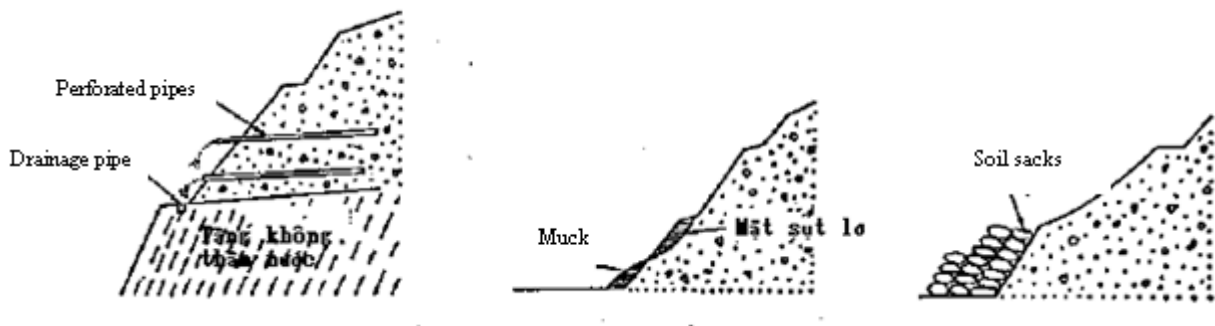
Drainage with horizontal boring and stacked soil sacks in emergency
